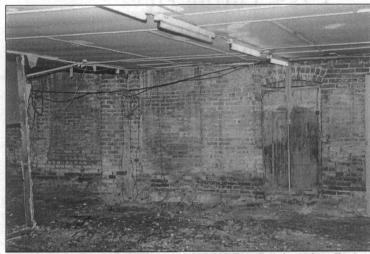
Brick filled windows and doorways in 520-522 East Grand, south wall, view southeast (photo by James Jacobsen, February 2007)
